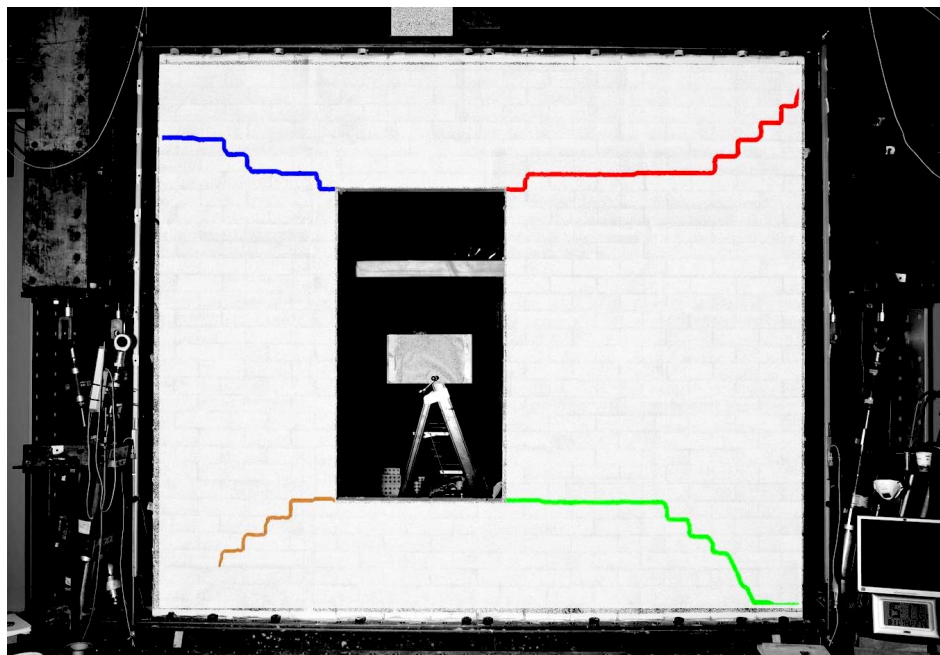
Calcium-silicate wall tested with final cracks highlighted.
